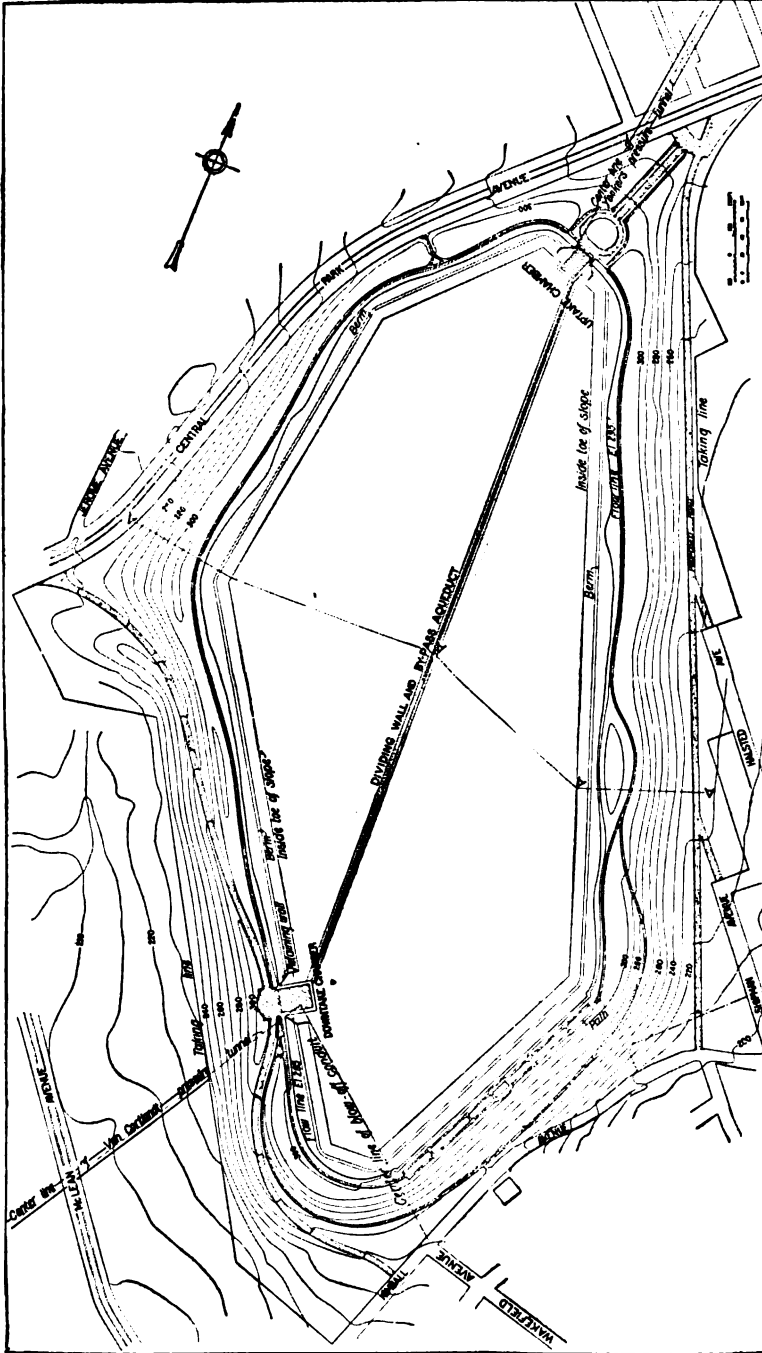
Hill View Reservoir. Contour Plan Showing Uptake and Downtake Shafts and Adjoining Yonkers and City Aqueduct Pressure Tunnels. Also By-pass Aqueduct in Dividing Weir.
